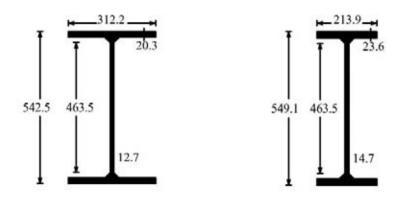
cross-section of columns and beams for steel model, in mini meter
